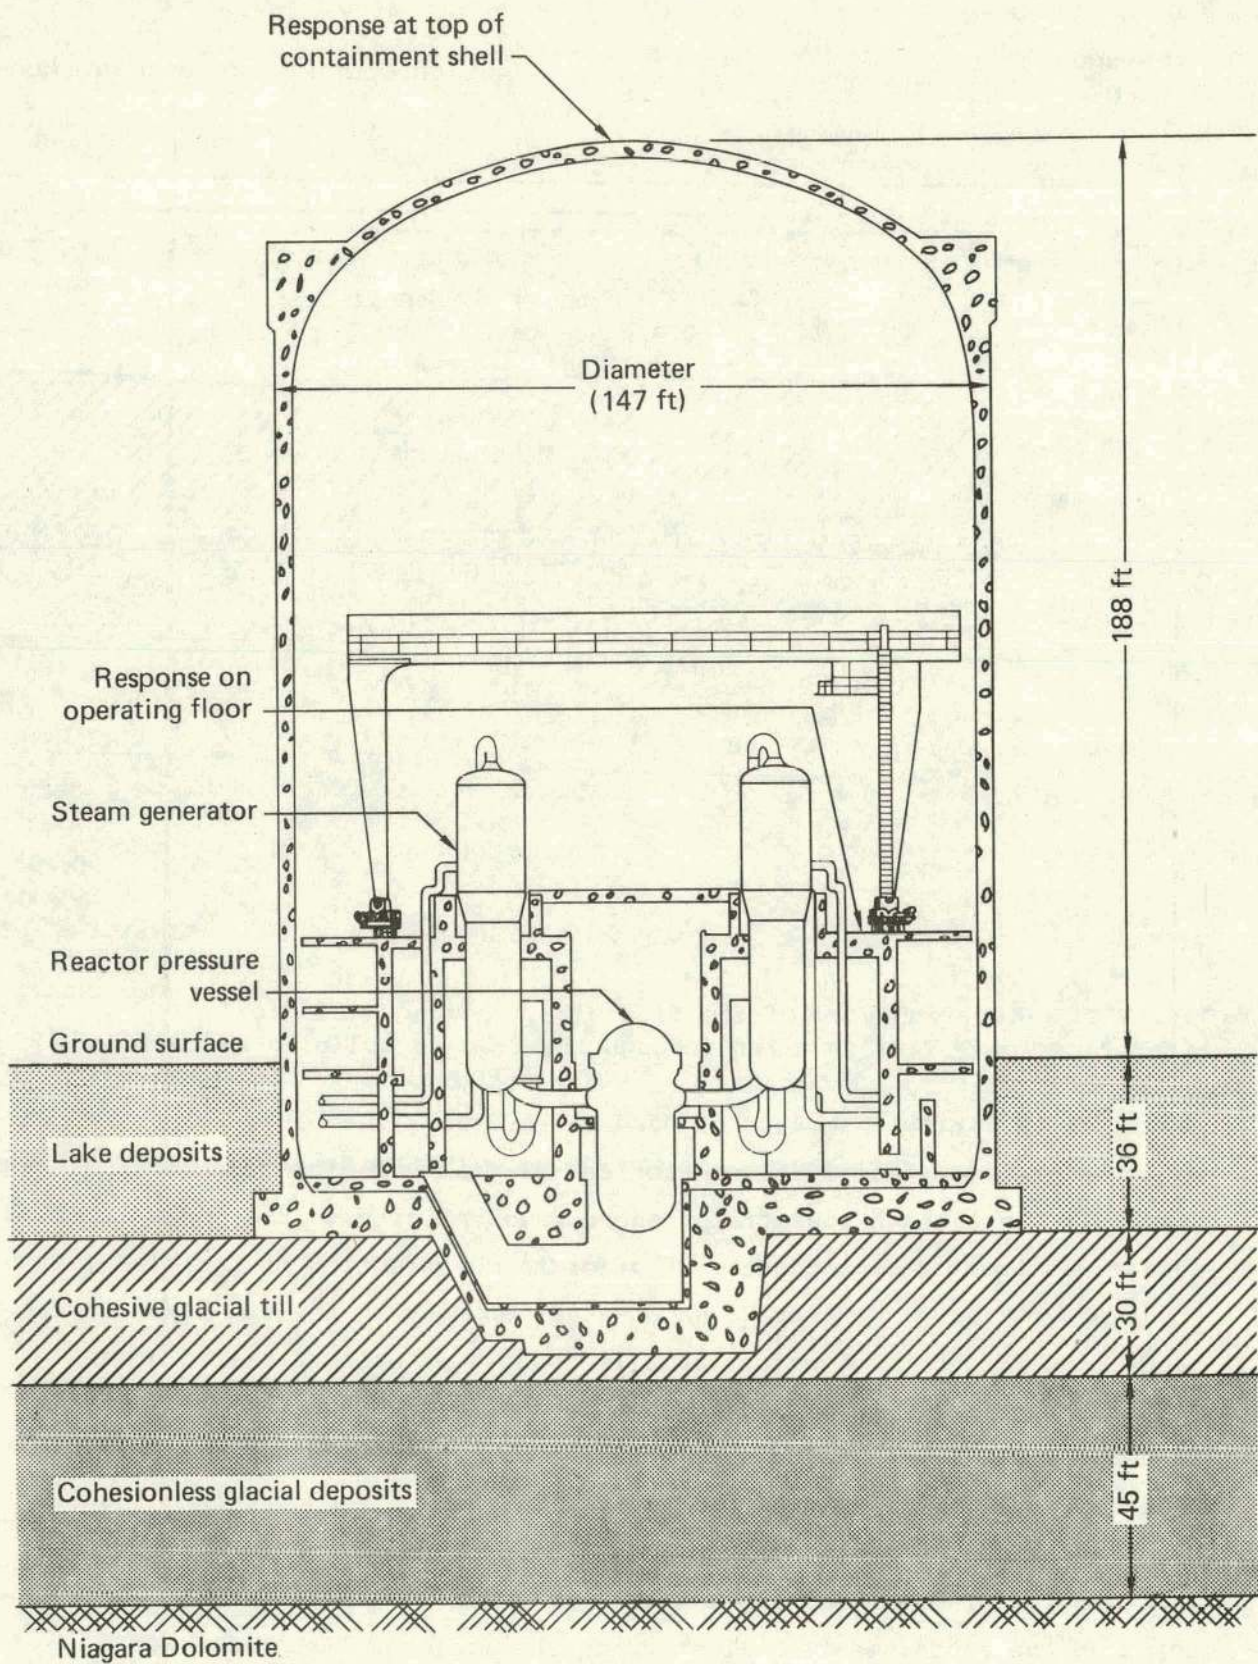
Simplified elevation view of Unit 1 reactor building, facing west.
